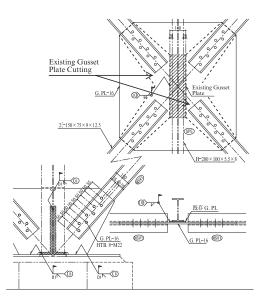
Example of seismic retrofit in steel structure (Additional bracing)
